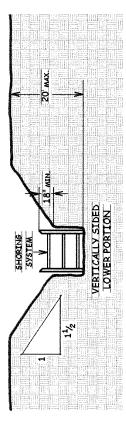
Benching and Sloping for Excavations Made in Type "C" Soil
